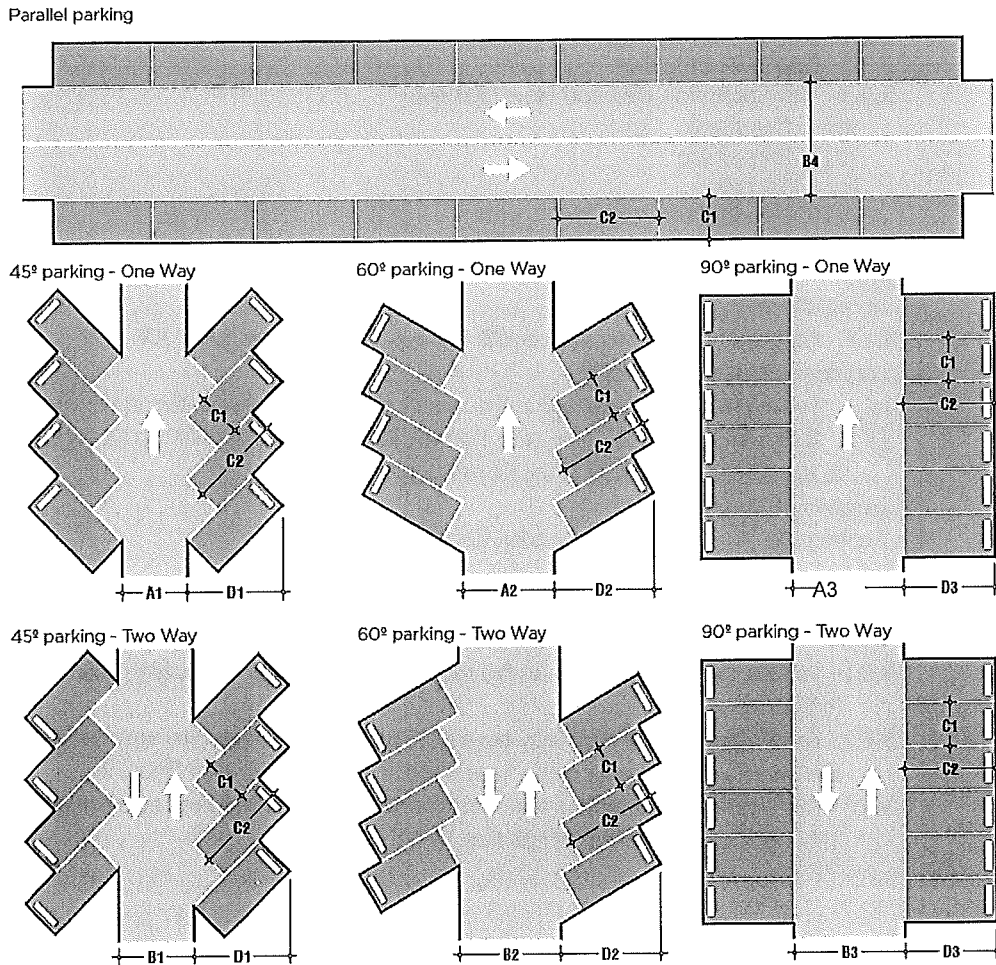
Parking Lot Stall, Aisle and Parking Bay Dimensions
